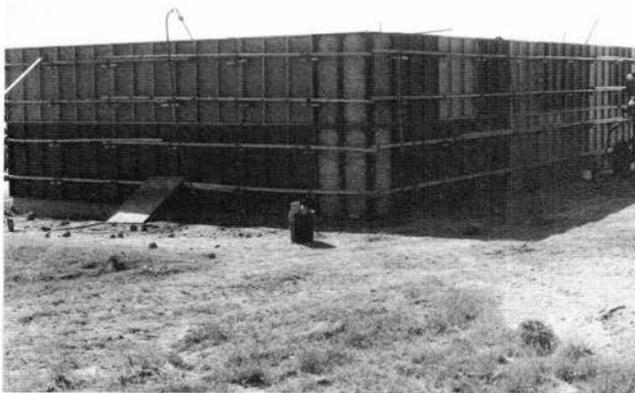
Setting of the wooden forms for construction of the rammed-earth walls, Huston Construction Company building site, Edgewood.
